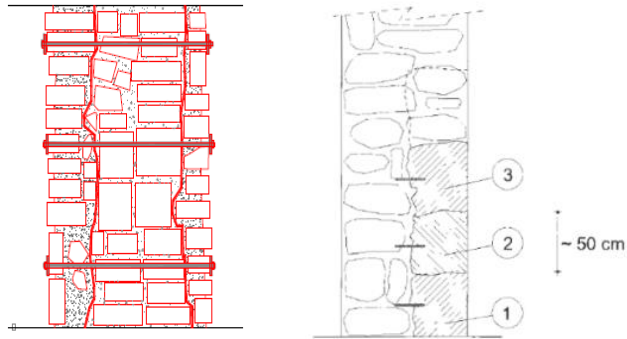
On the left side: Masonry wall section with intramural steel ties. On the right side: Local dismantling and reconstruction example. From [104].
